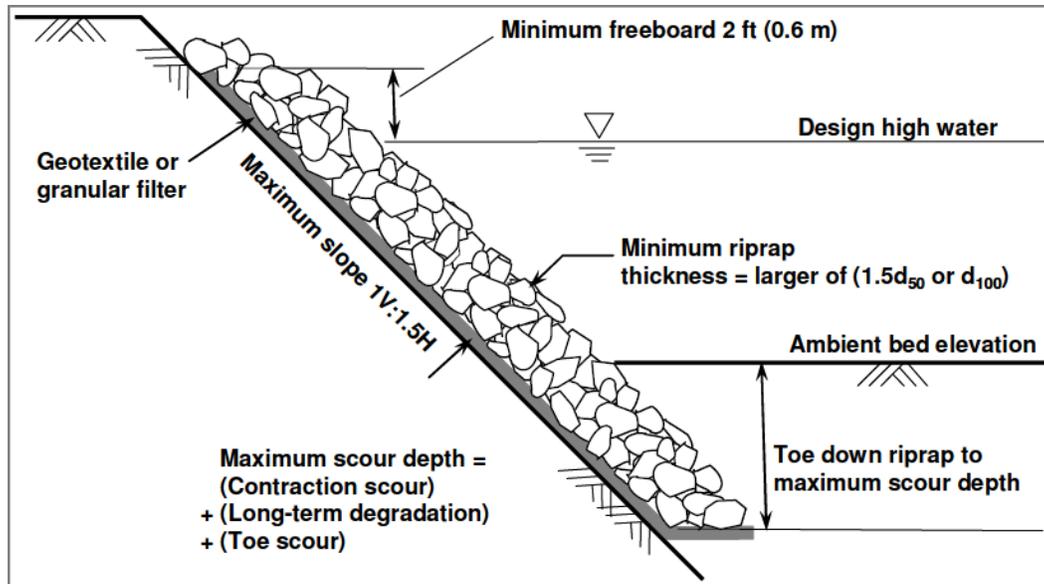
Riprap revetment with buried toe (after Lagasse et al. 2009).
